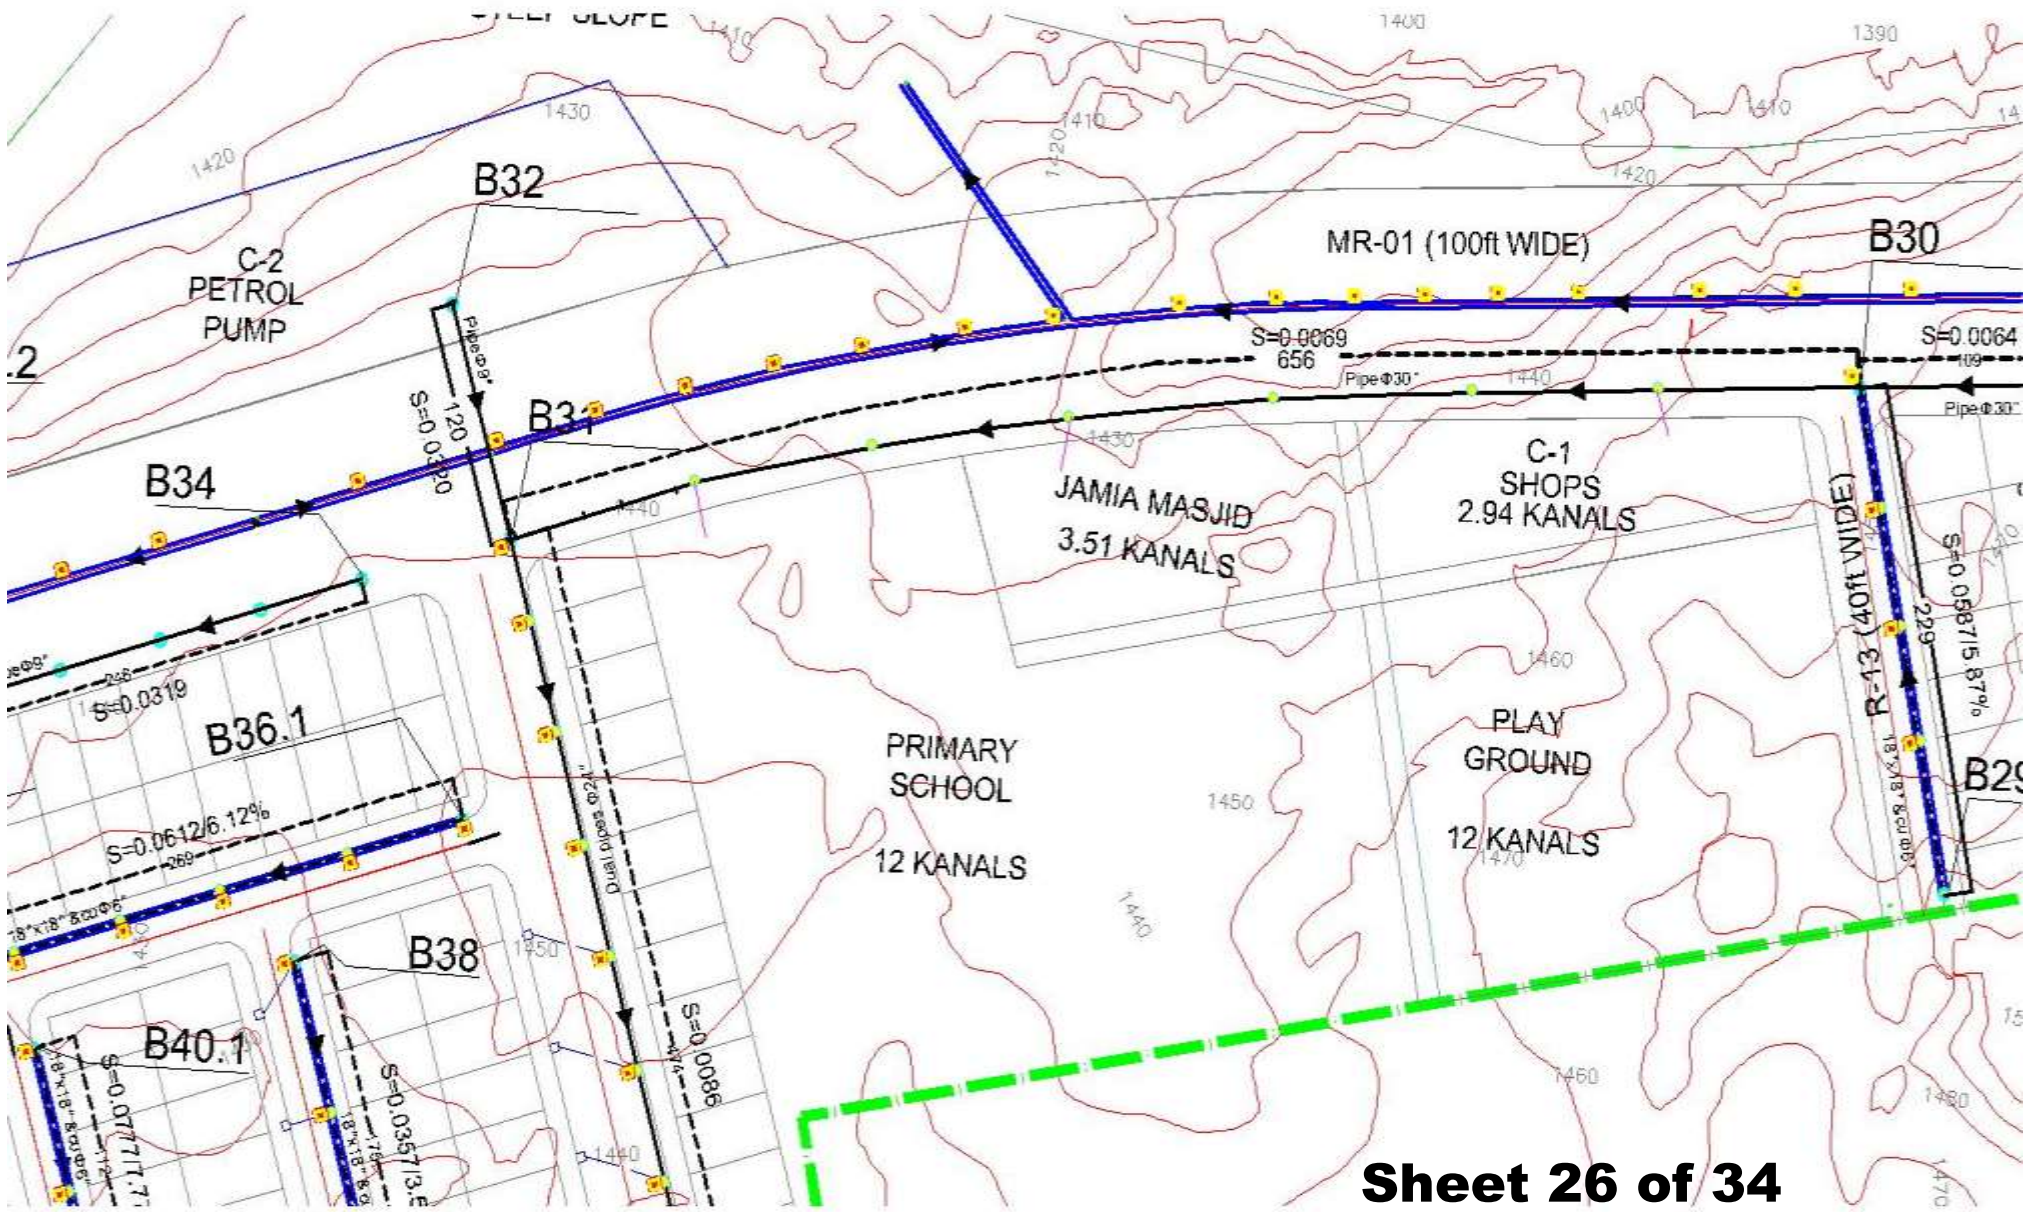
Layout plan of Zome-2 junction of MR-01 & MR-02
